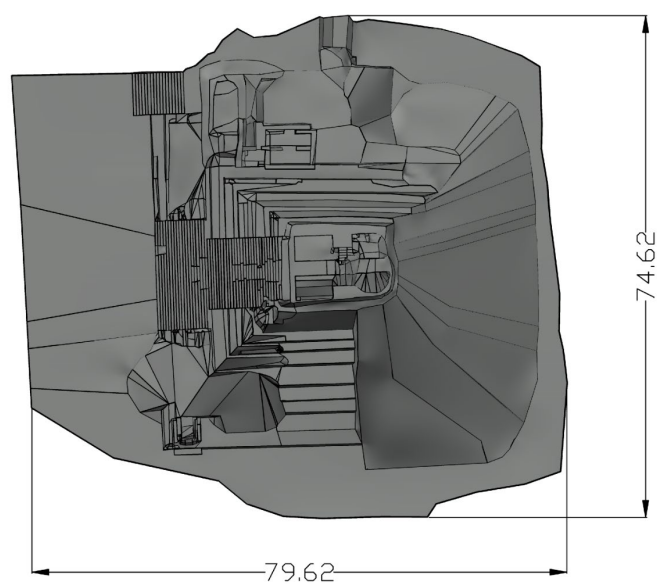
Rendered plan view of Temple 16's regenerated geometric model in AutoCAD (units in meters).
